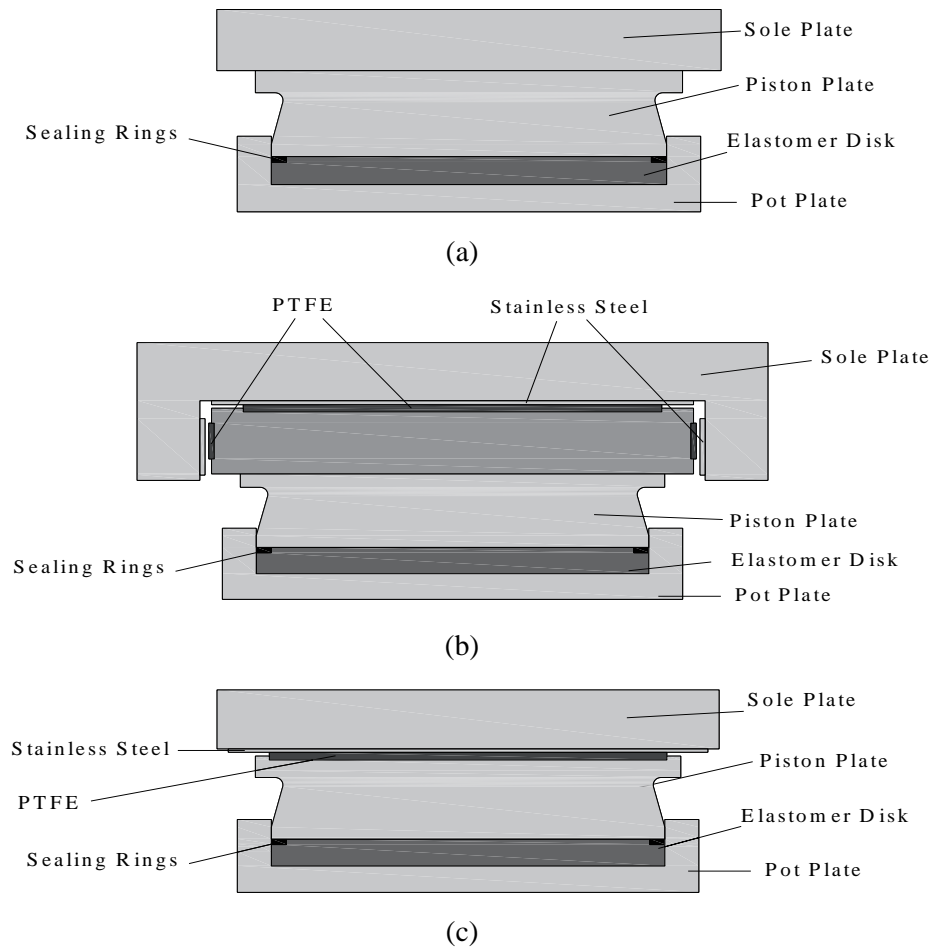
Sketch of (a) fixed pot bearing; (b) guided pot bearing; (c) free pot bearing.
